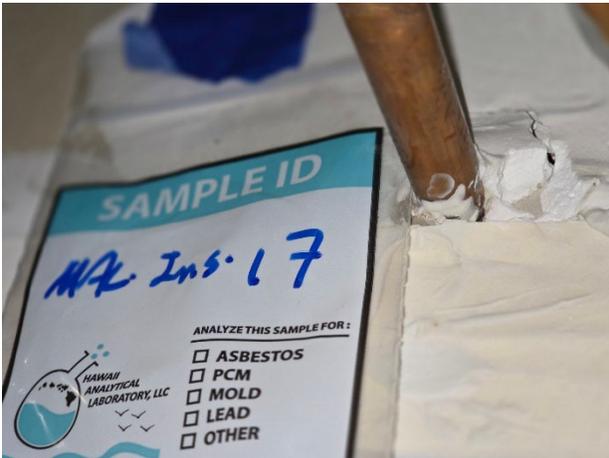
Sample ID: MAL-Ins-17 White joint compound. Above Drop Ceiling. Bathroom.
